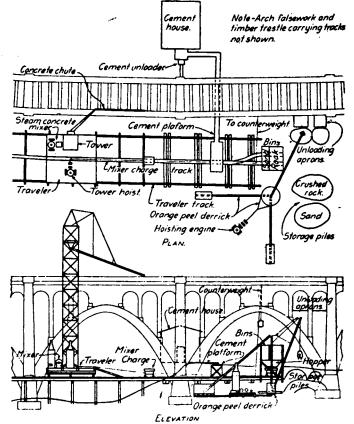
Concreting Plant for Two Concrete Bridges on the C. M. & St. P. Ry, at Rosalis, Wash.
